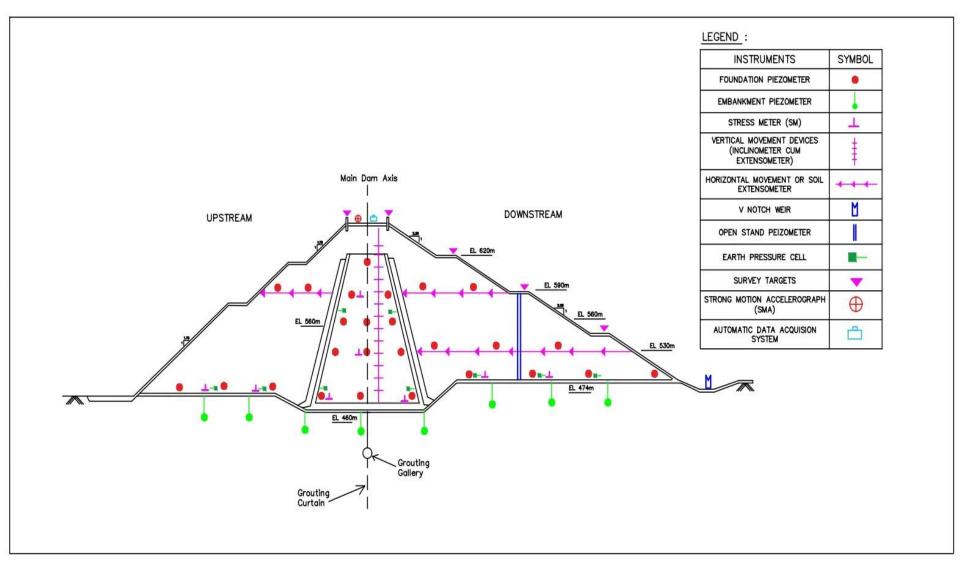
Typical Instrumentation Plan for Embankment Dam
